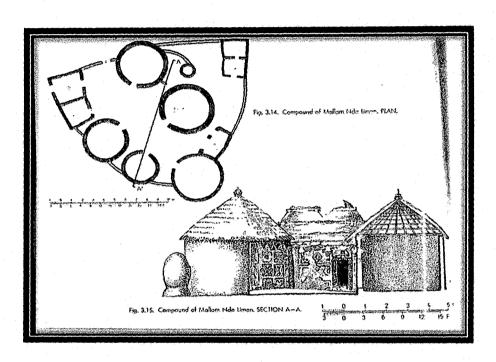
A FLOOR PLAN SHOWING THE PLAN AND SECTION OF CIRCULAR BUILDING FORM SOURCE: ENCYCLOPEDIA BRITANICA 2000
